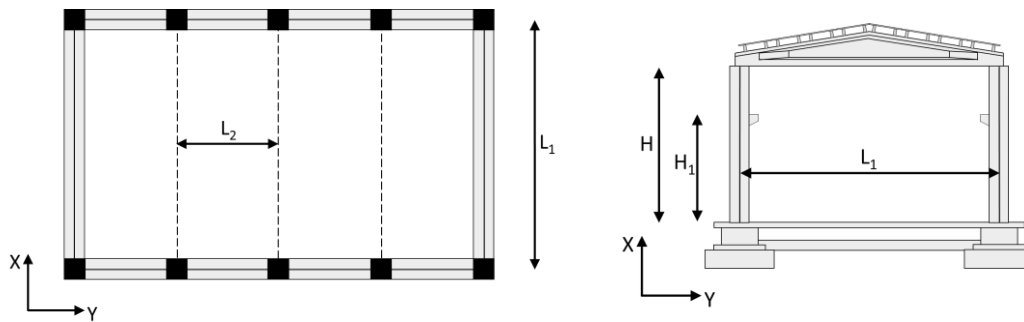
Geometric layout of the investigated buildings: (left) plan view and (right) elevation view.
